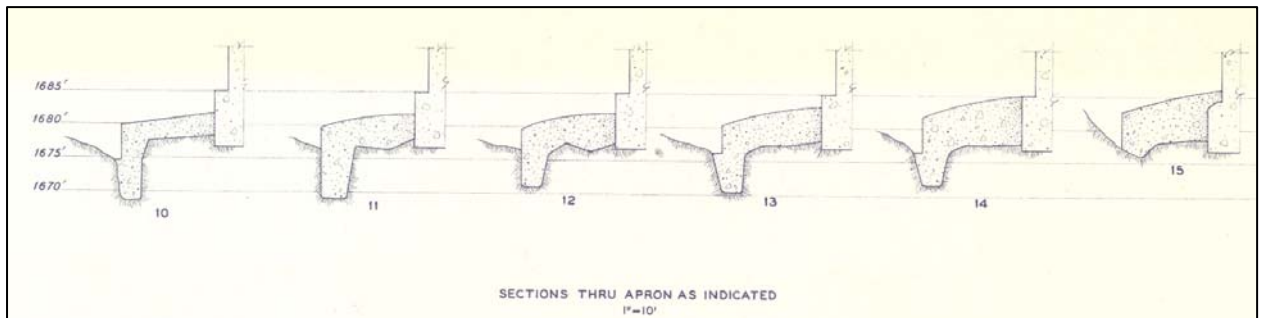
Profile of apron and cut-off wall at Brown Mountain Dam.
